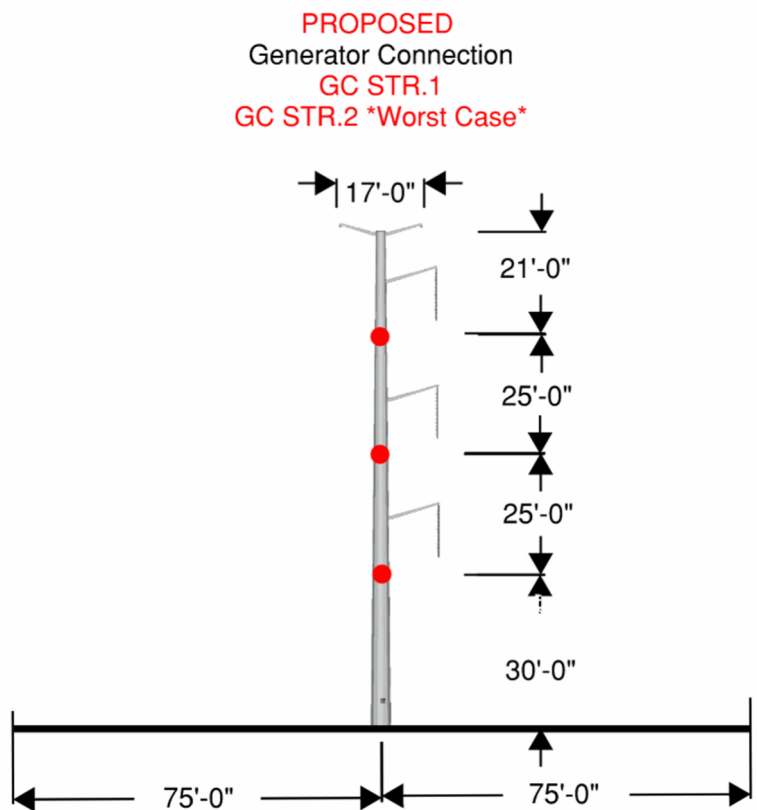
Proposed structure GC STR.1 and GC STR.2 Cross Section
